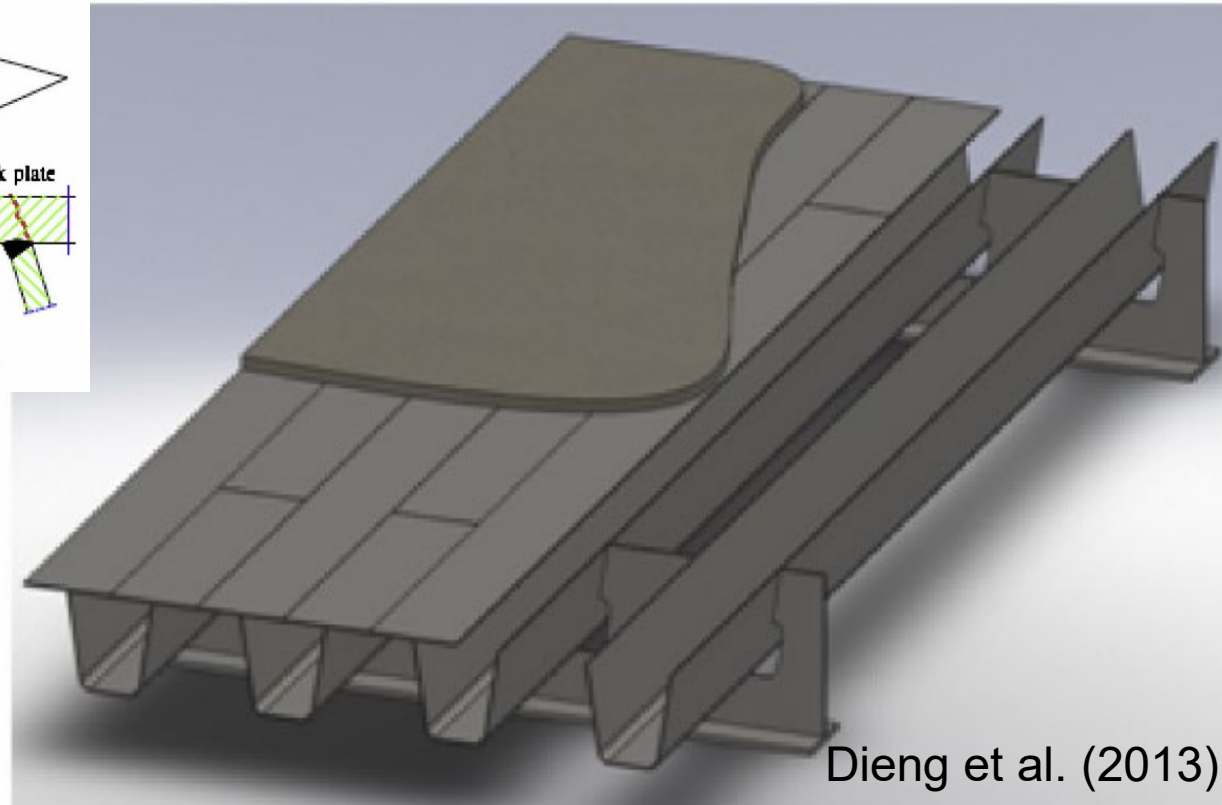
Orthotropic steel bridge deck geometry including topping layer.
